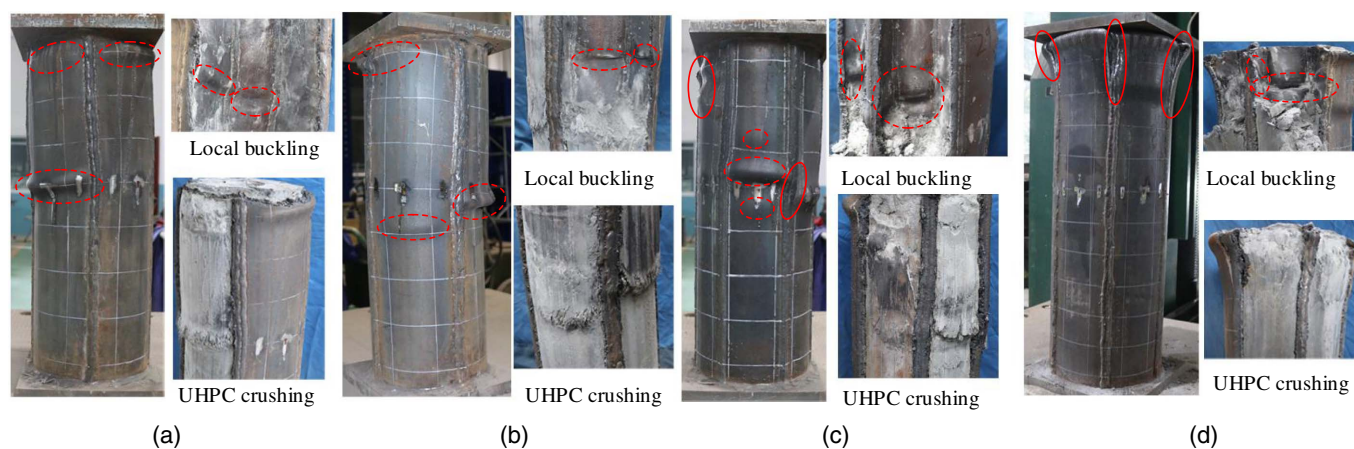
Photos of the circular UHPCFDST specimens after testing: (a) C203-4-76; (b) C203-4-114; (c) C203-6-114; and (d) C300-6-203A.
